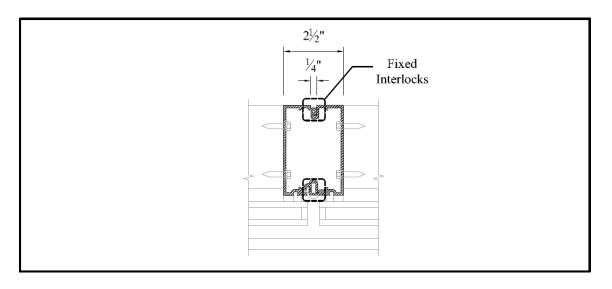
Standard SSG vertical mullion detail, Kawneer 1600 SS curtain wall system. Adapted from Kawneer Inc. (2014)
